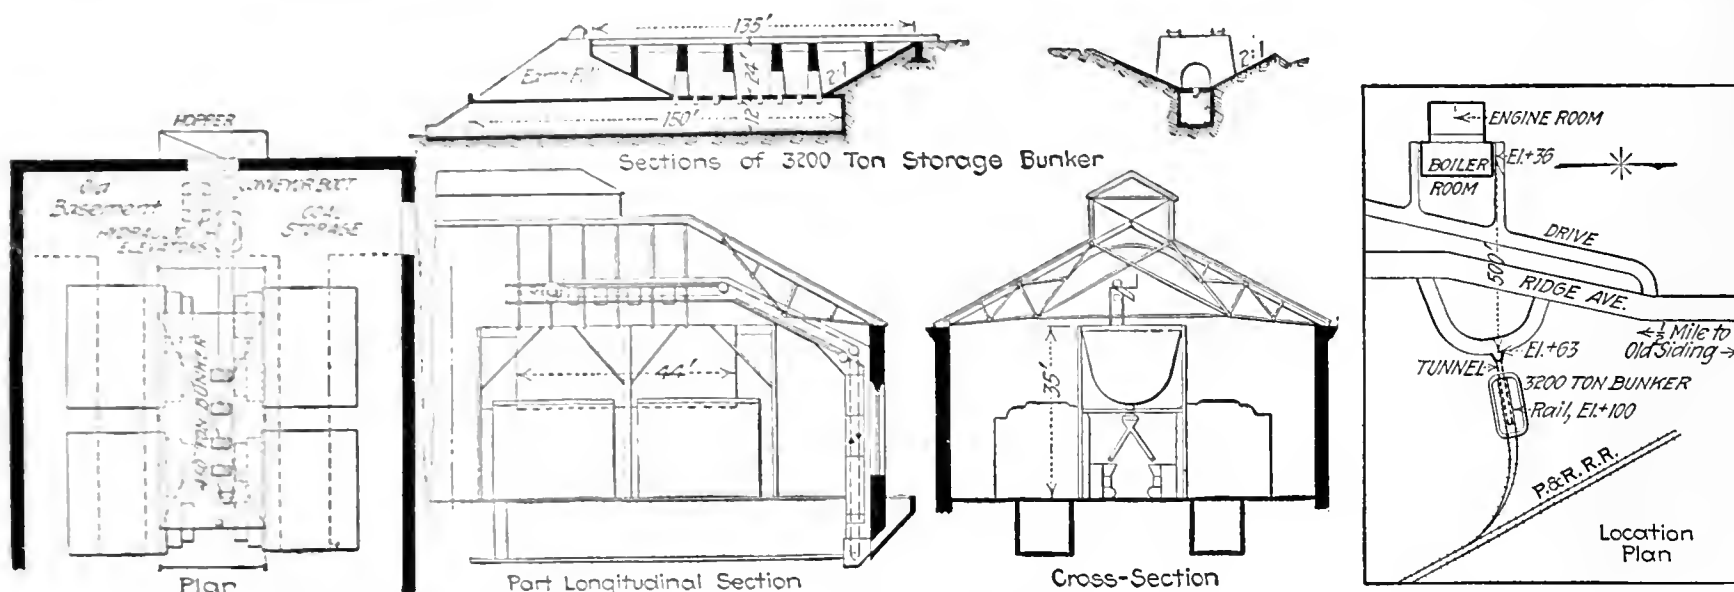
GENERAL LAYOUT AND DETAILS OF QUEEN LANE STATION COAL-HANDLING PLANT
